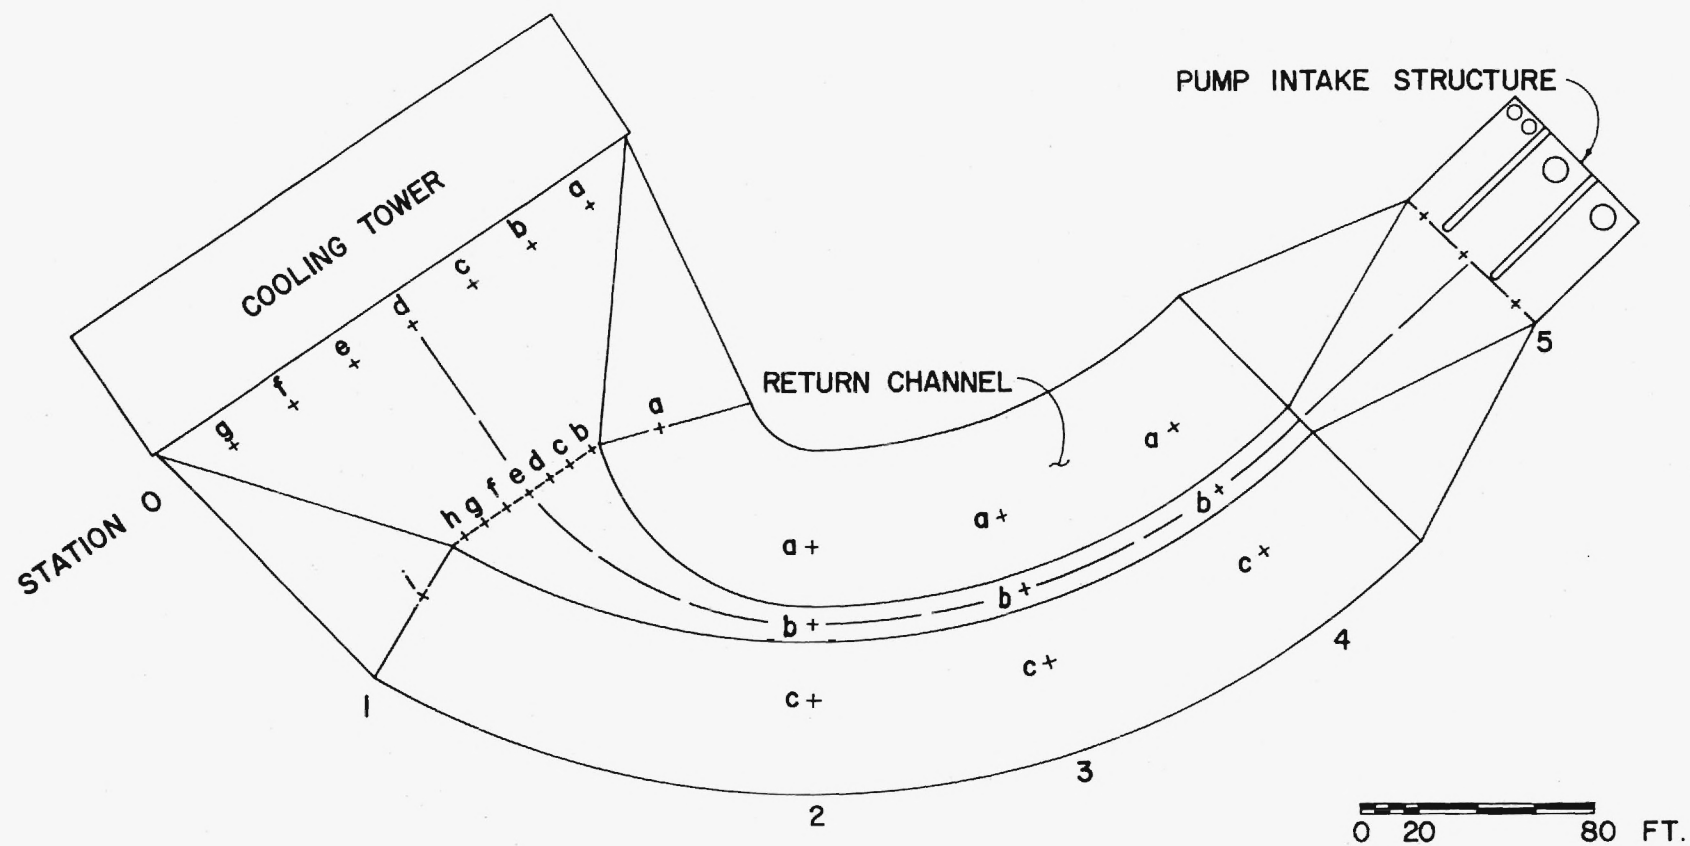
PLAN VIEW OF 1:25 SCALE MODEL SHOWING MEASURING STATIONS
